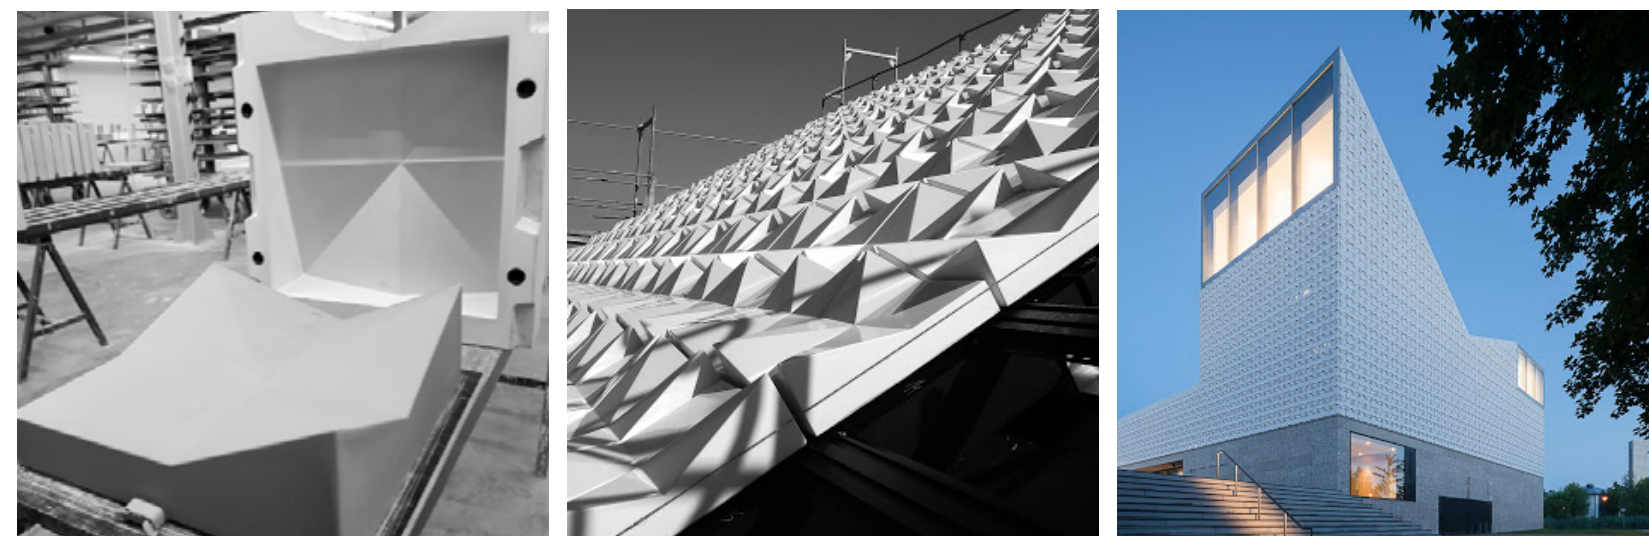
Slip cast building system at Saint Rupert Church by Meck Architekten.
